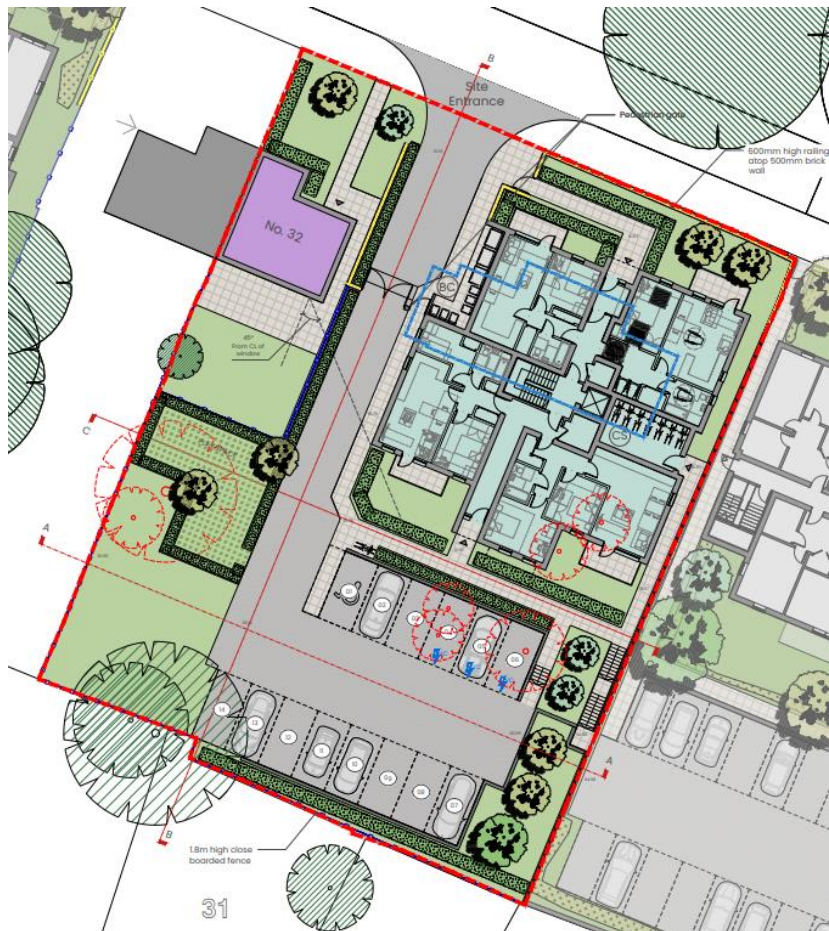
Proposed site layout and 45 degree line (NEED CHANGE)
